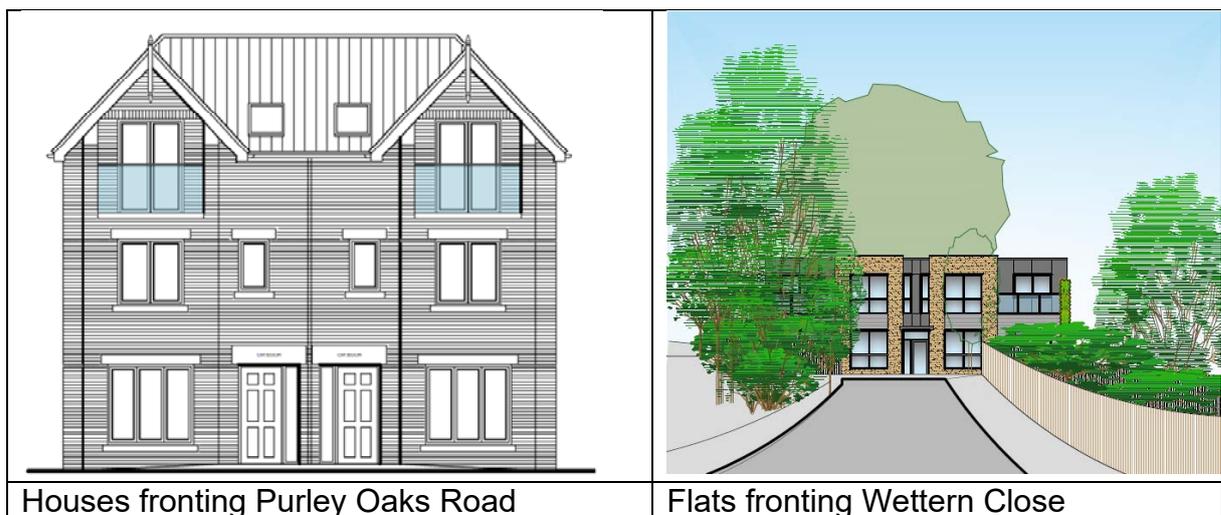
Front elevation of proposed houses at the front of the site and the flats at the rear.
